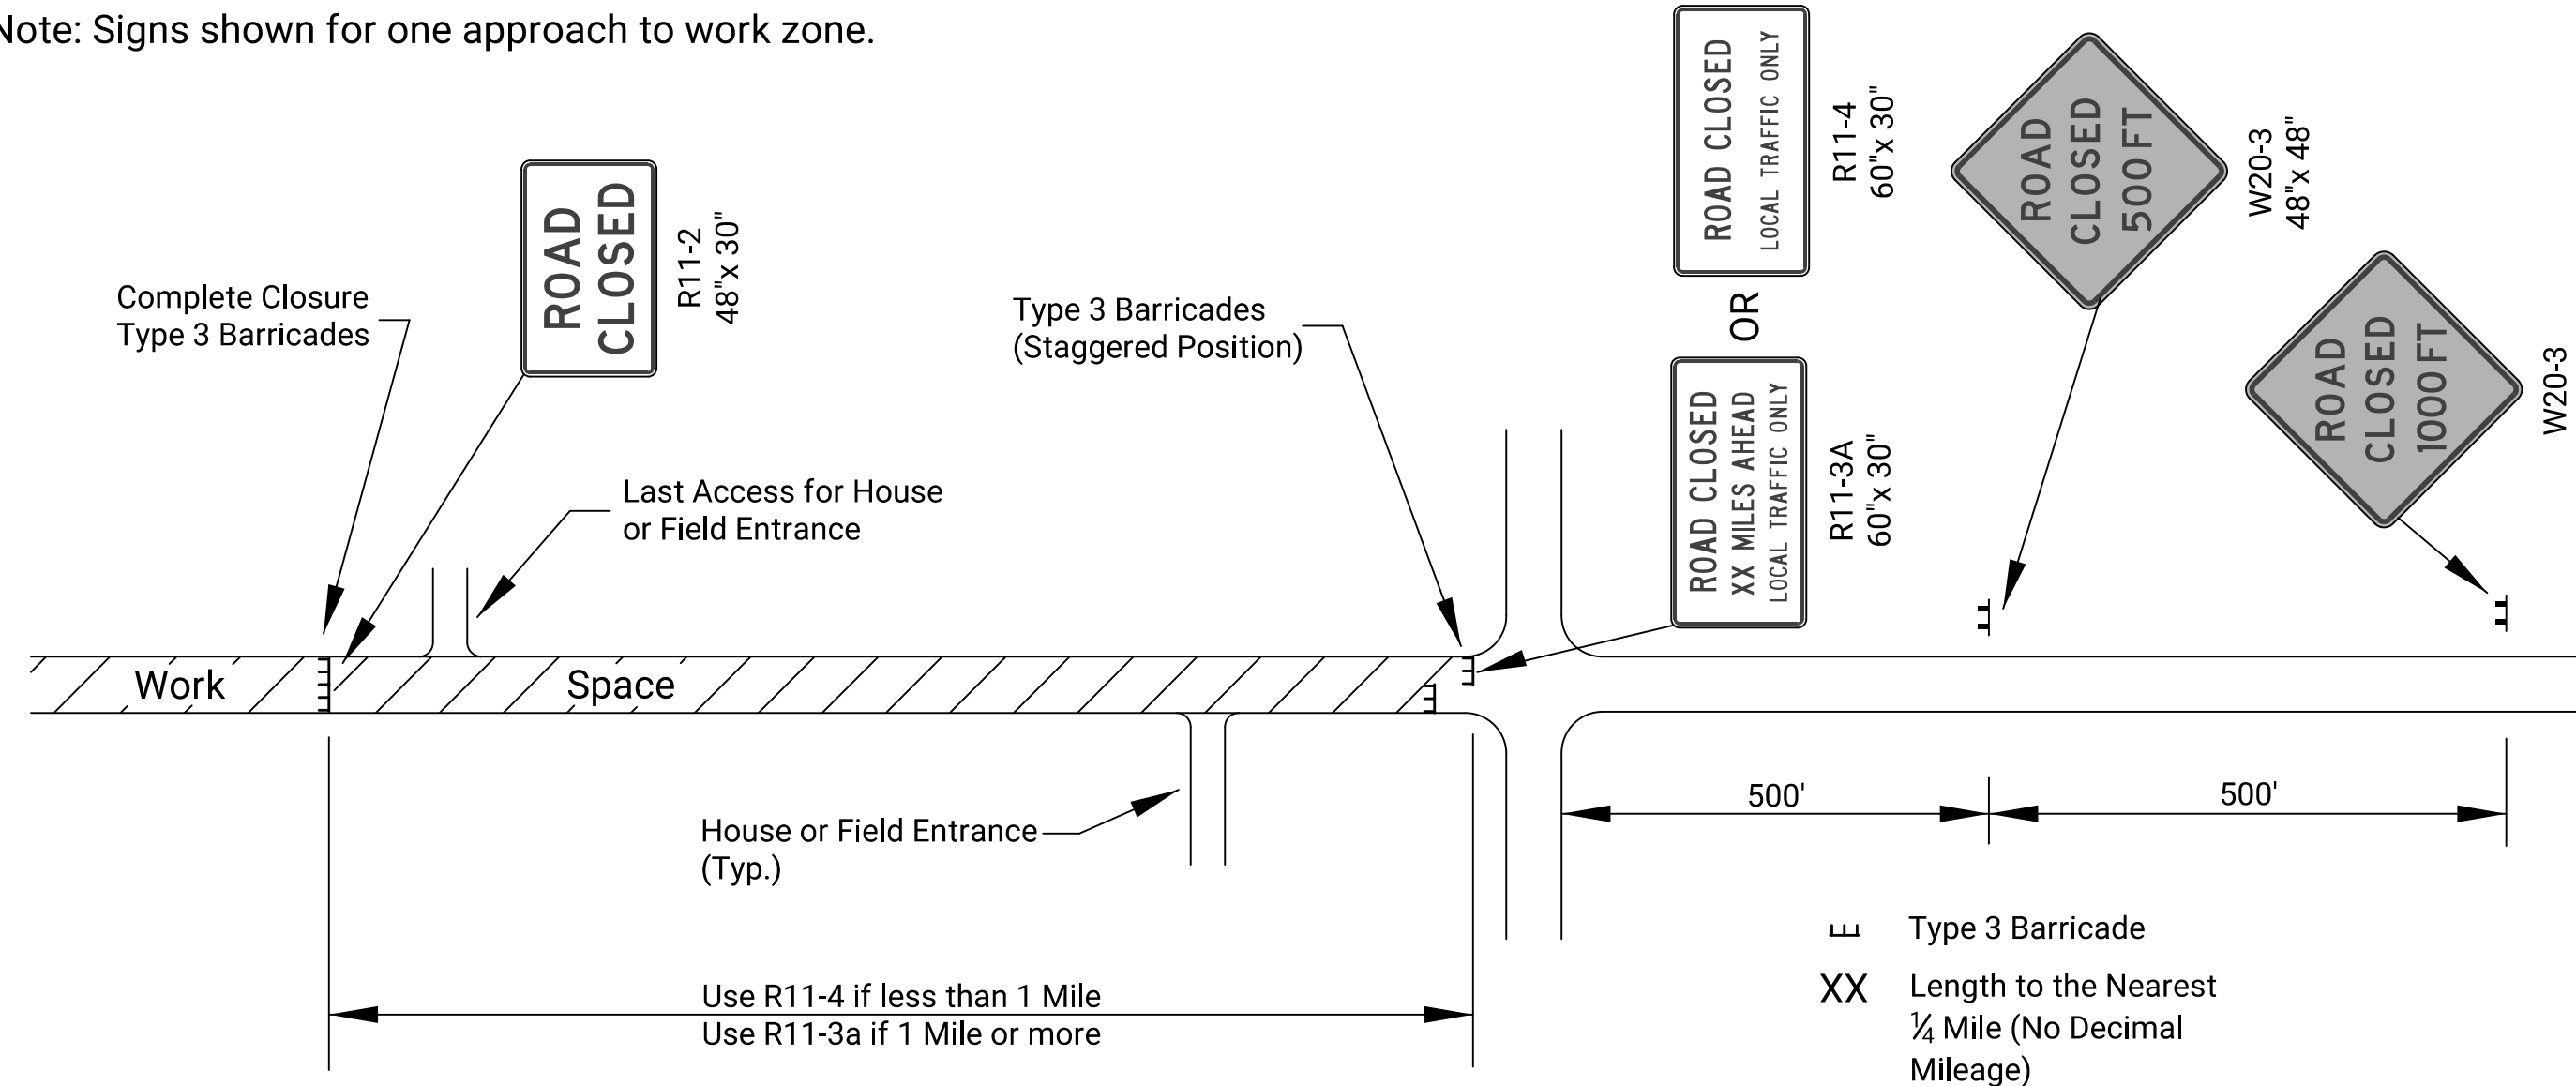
TYPICAL SIGNING FOR ROAD CLOSURE - LOCAL TRAFFIC ACCESS
